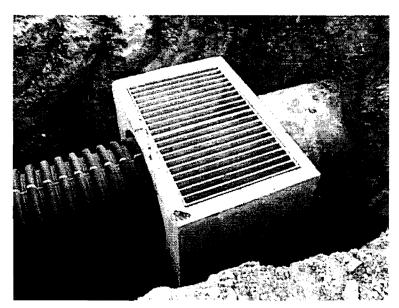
Existing Concrete Catch Basin and HDPE Pipe.
